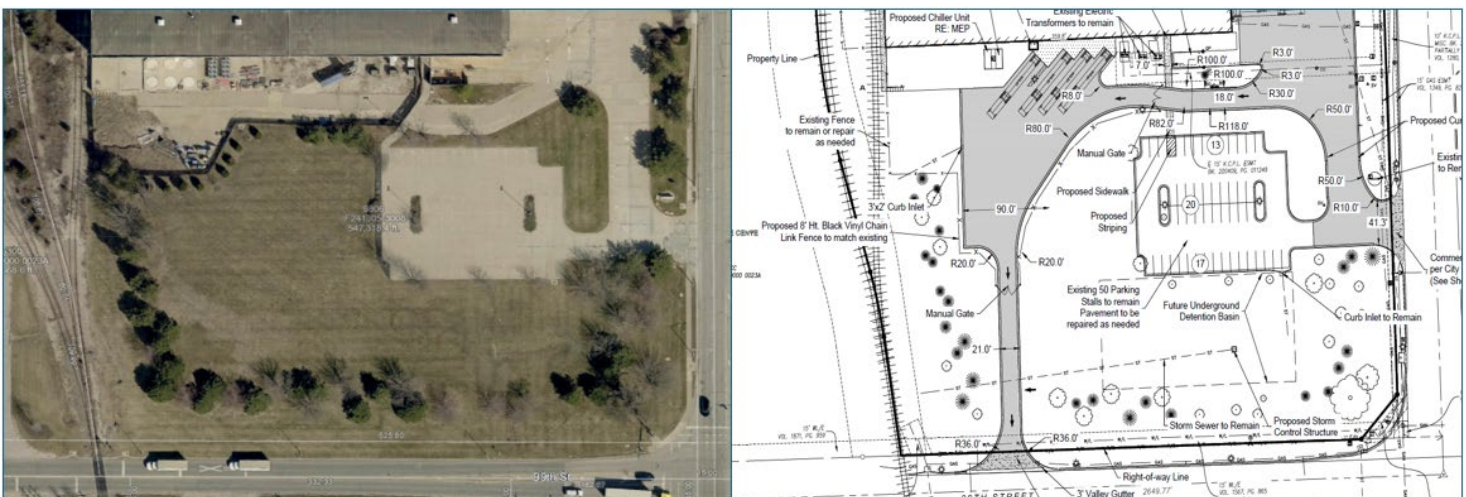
Current conditions and proposed plan (showing new 99th Street access point).
